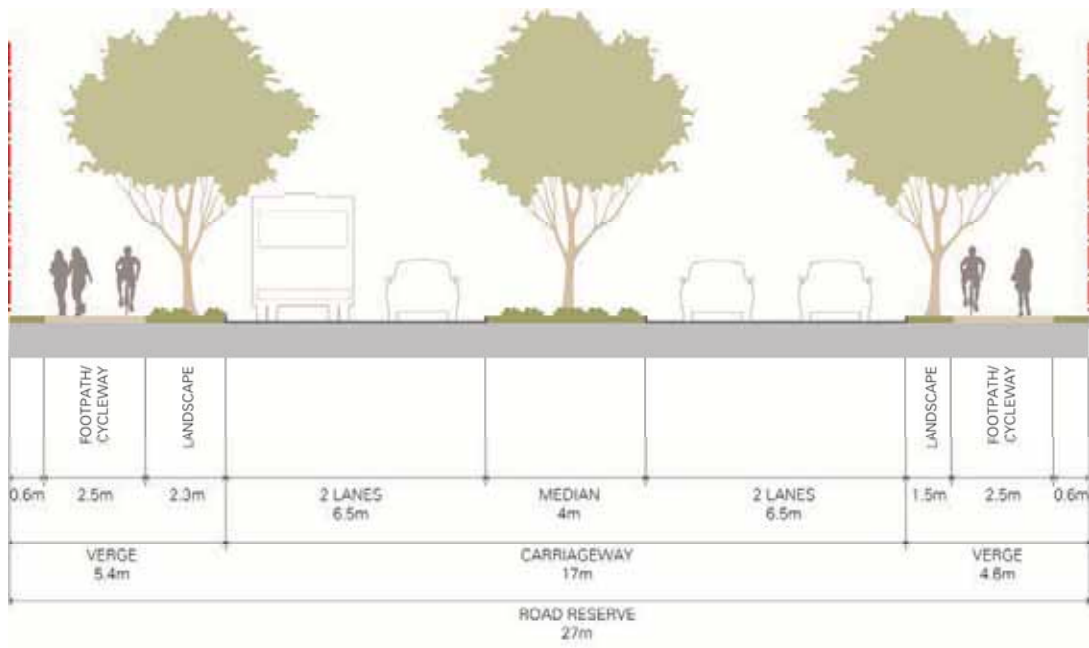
Typical Croatia Avenue / Macdonald Road section
